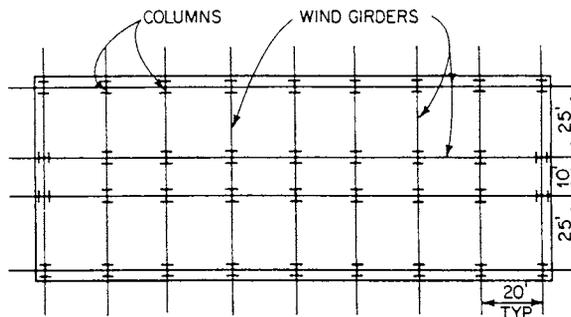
Typical framing plan for narrow, high-rise building orients columns for strong-axis resistance to lateral forces in the narrow direction.
